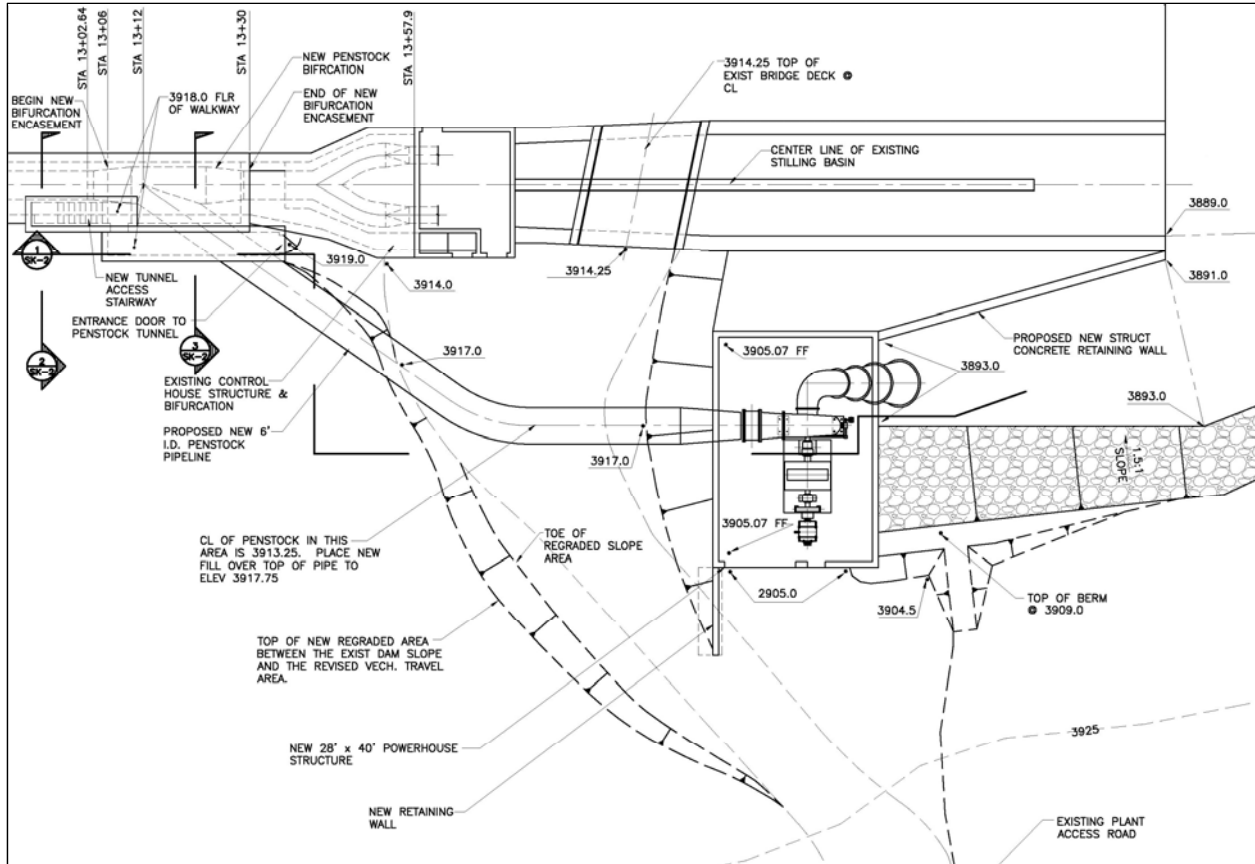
DRAWING OF PROPOSED MODIFICATION TO MASON DAM OUTLET WORKS.
